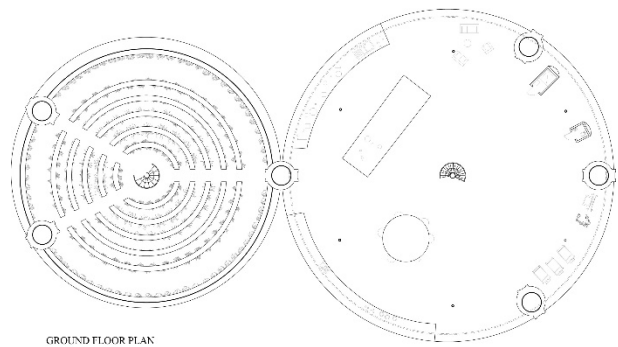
Interior Layout Ground Floor (Source: Magda Borovina)
